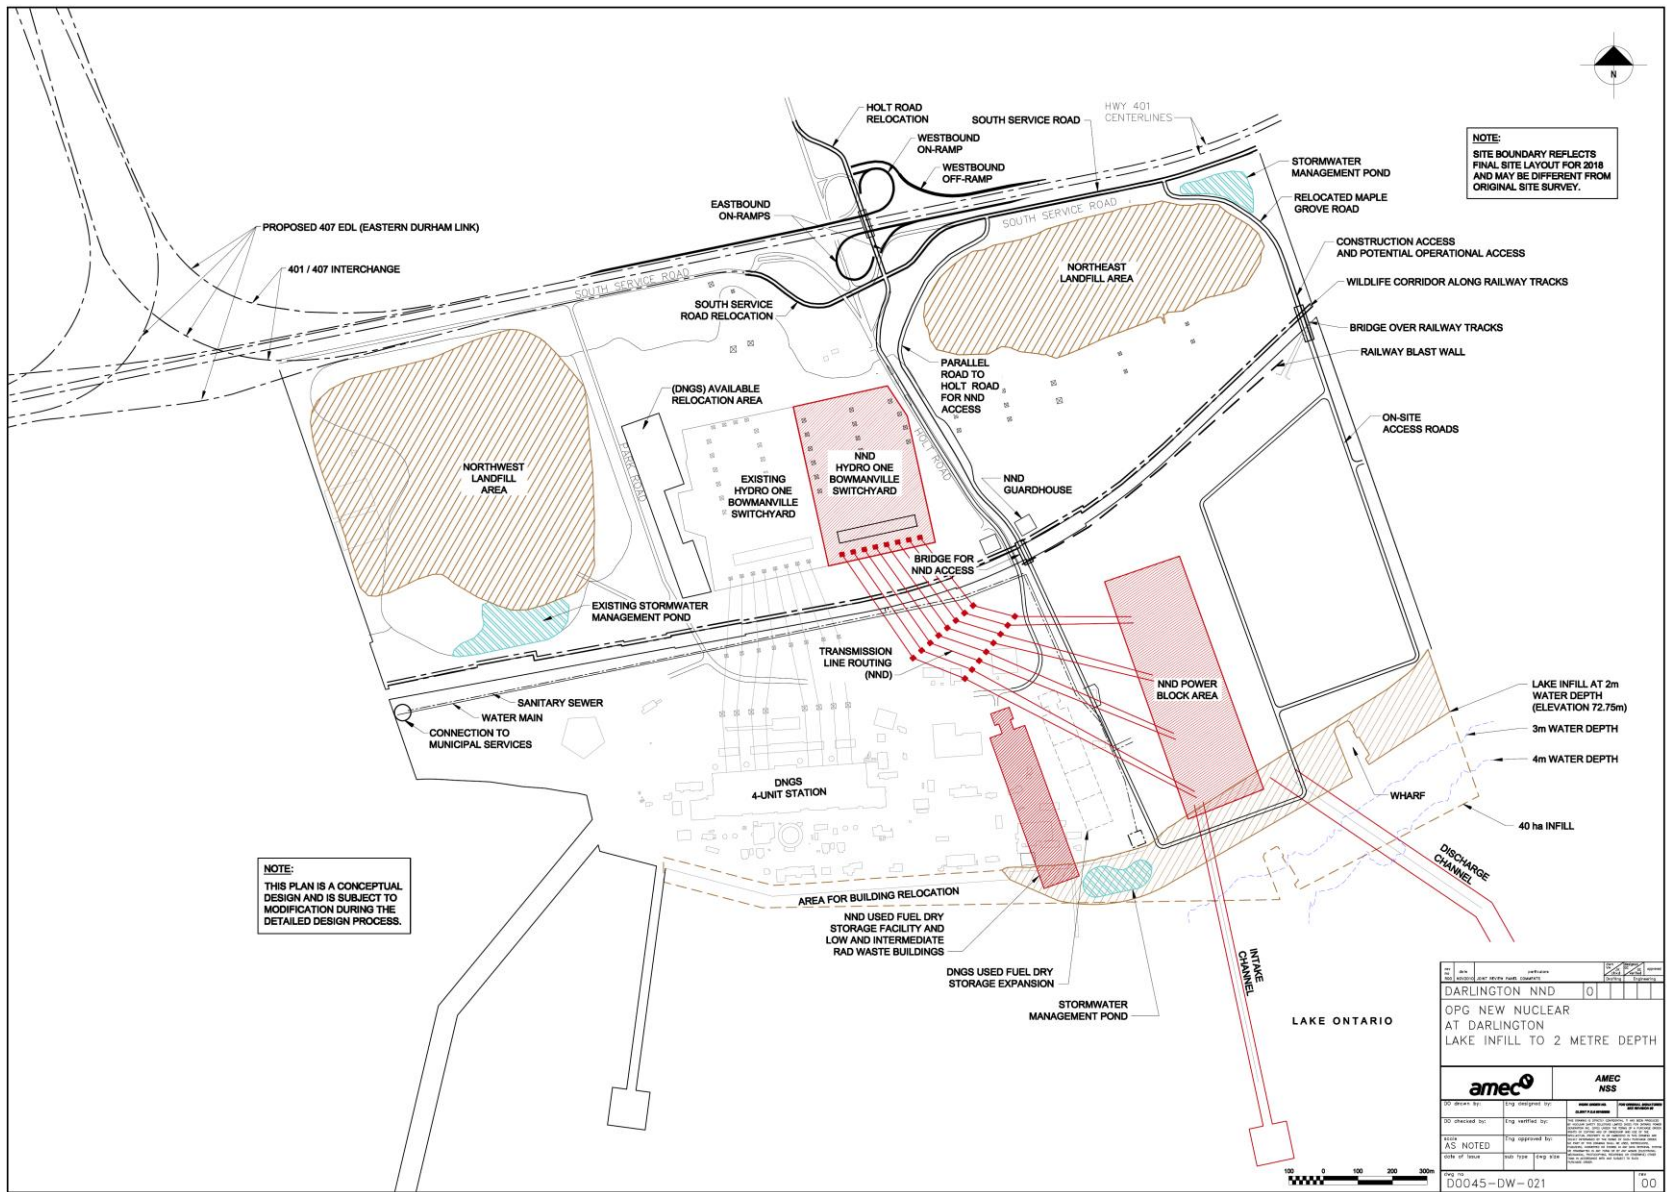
OPG Darlington New Nuclear Project (DNNP) Proposed Site Layout
